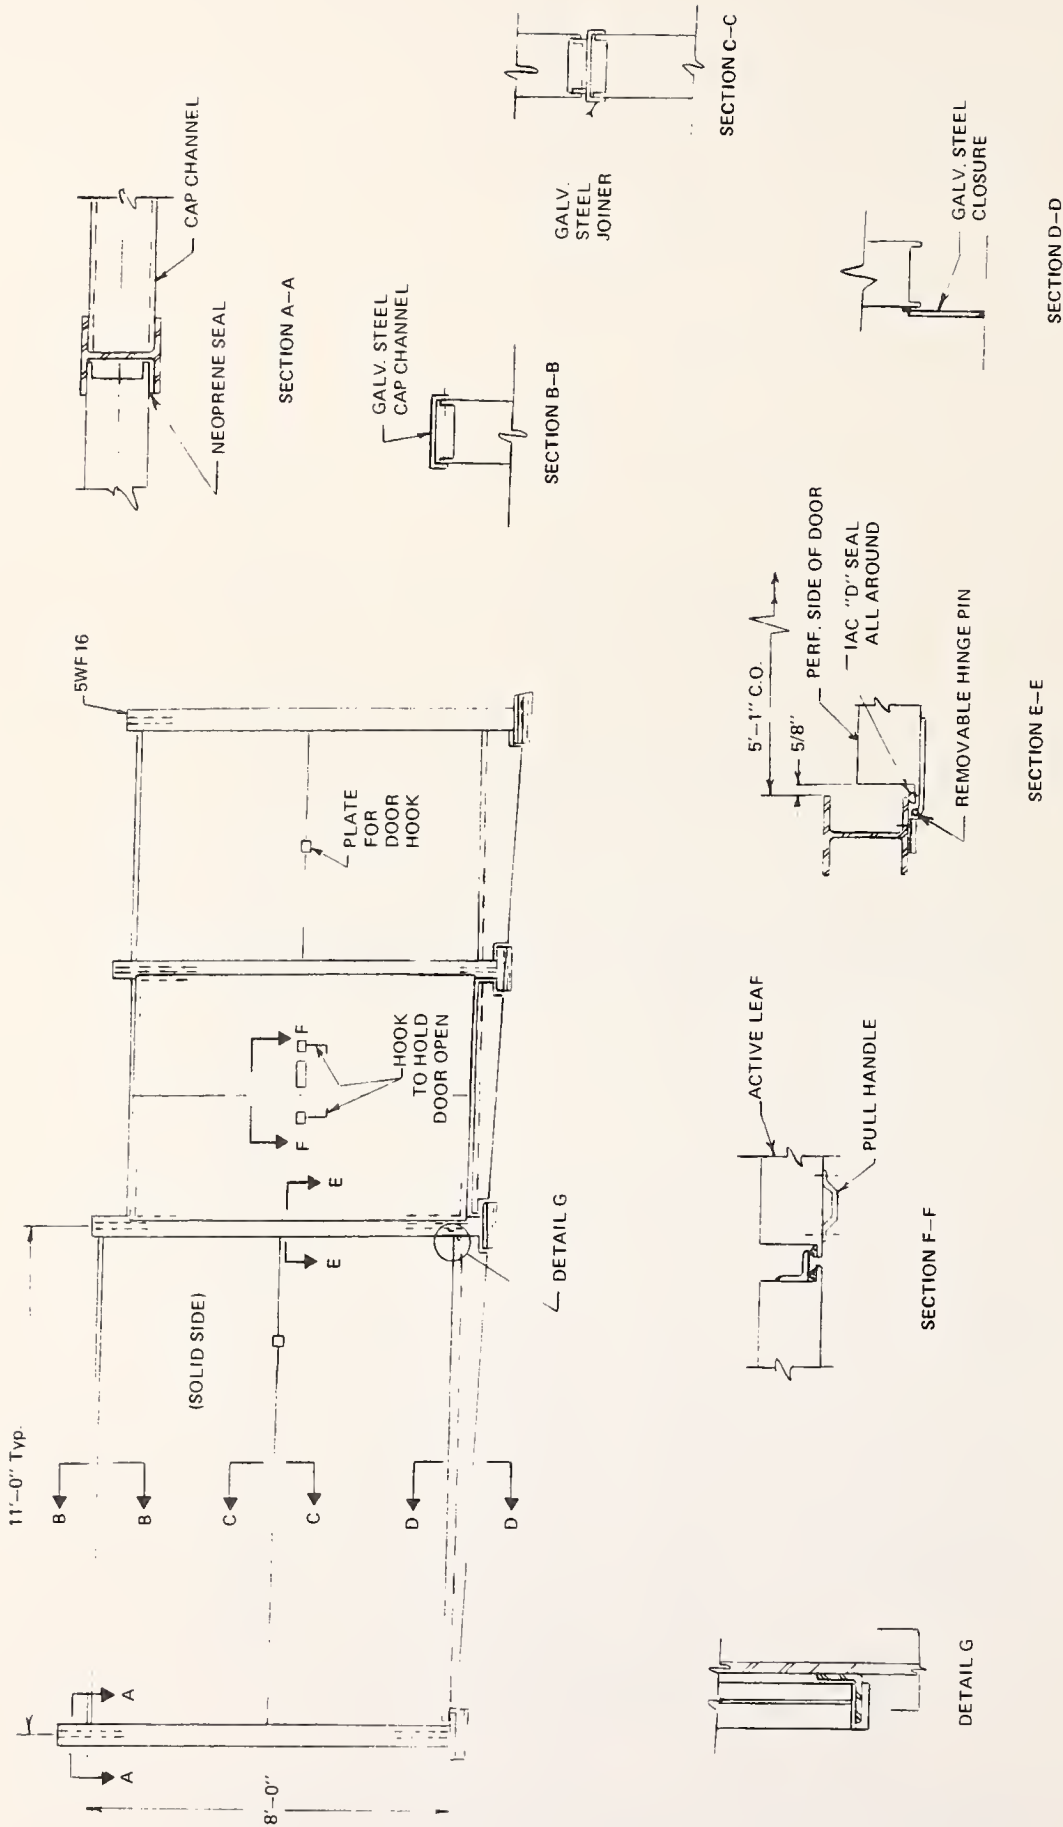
PLAN VIEW OF ACOUSTICAL BARRIER SYSTEM FOR BURLINGTON NORTHERN GROUP RETARDER NO. 3 NORTHTOWN YARD
